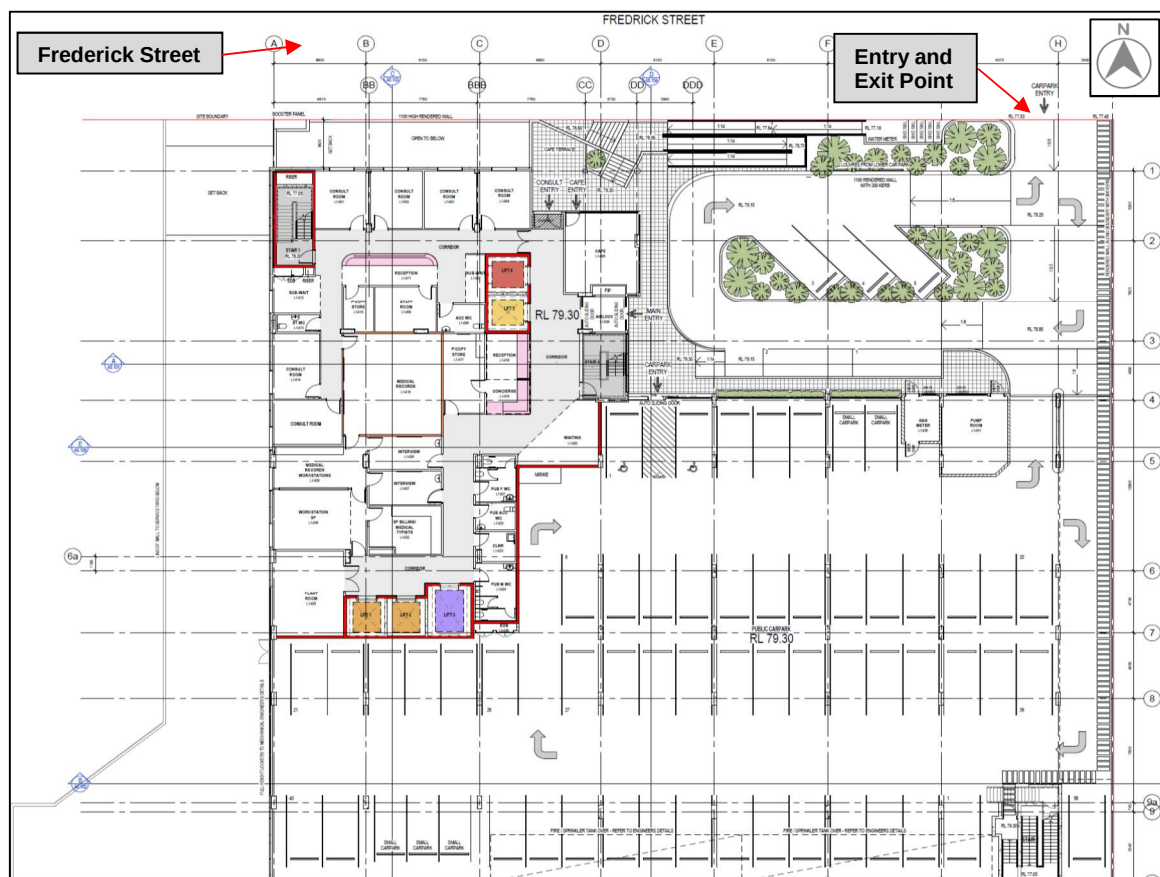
Proposed Level 1 Car Parking Arrangement (source: EIS)
